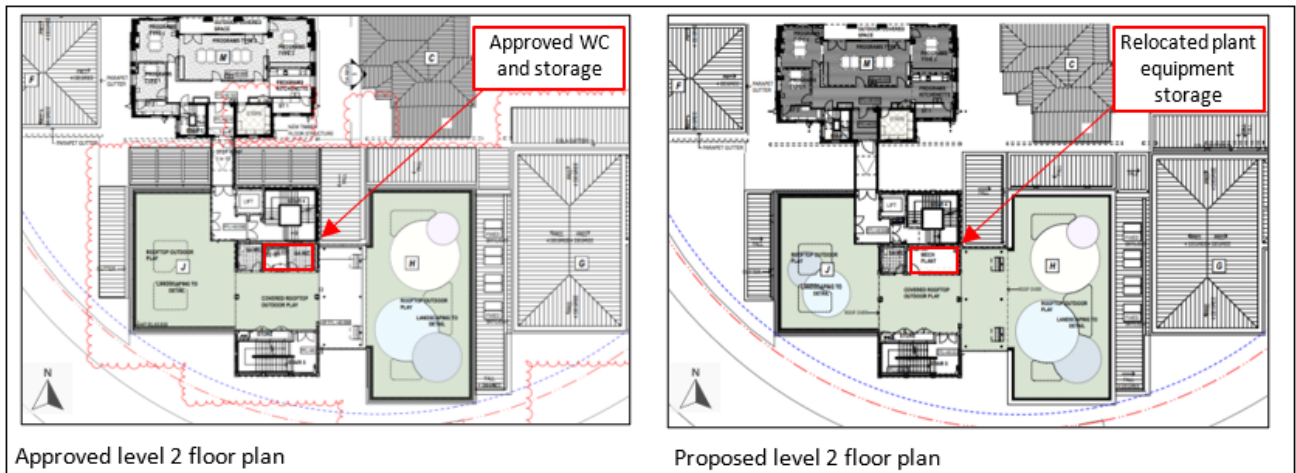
| Relocated plant equipment in Building J (Source: SRtS 2021)
